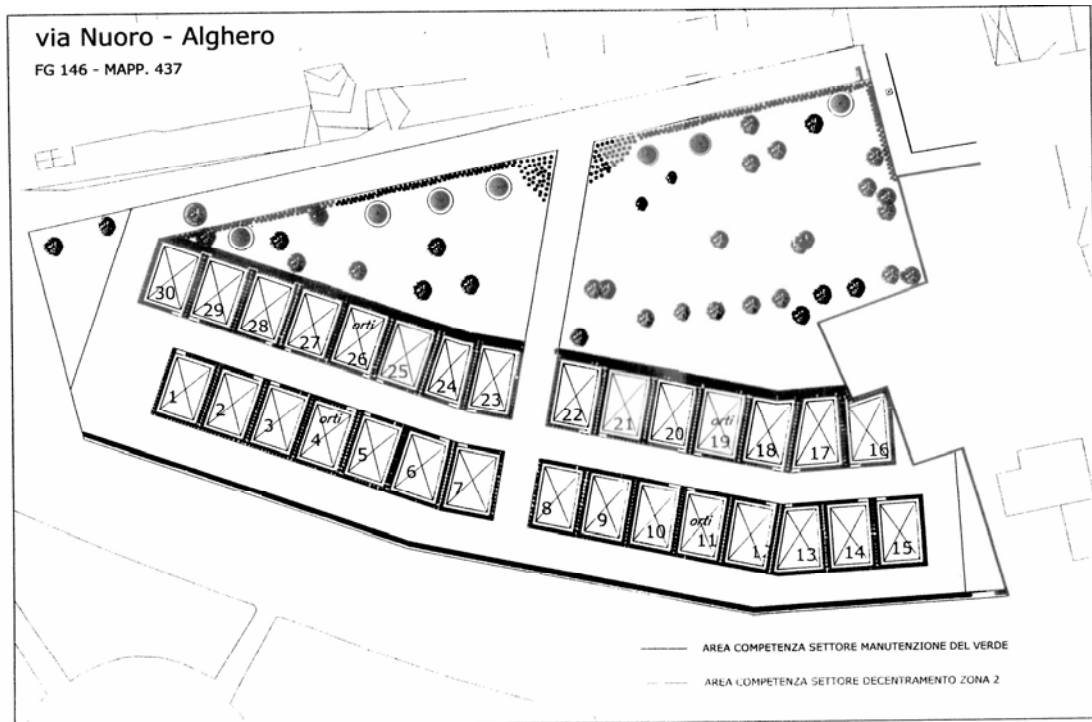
Site plan of GARDEN IN ZONE 2 garden<sup>22</sup>
